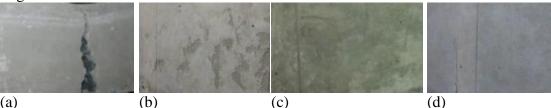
(a) Failure of PCC beam (b) Failure of BRC beam (c) Failure of TBRC beam (d) Failure of SRC beam
